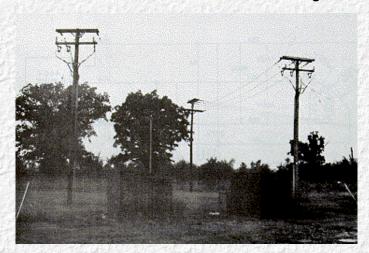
Dual Overhead Service with Pad-Mounted Transformers
